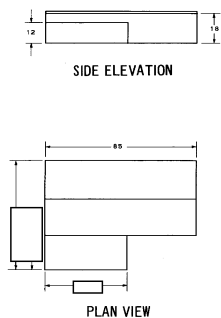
A. DRIVE-THROUGH BUILDING AT CHECKOUT AND STORAGE AREA.
